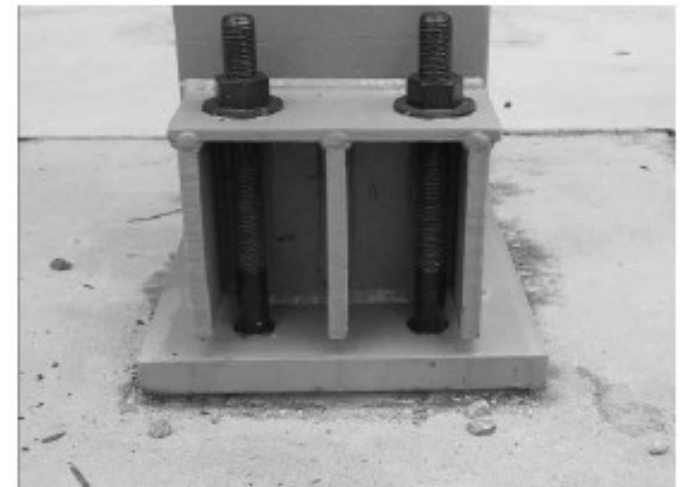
Column Connection: Base plate Foundation / Column C1
